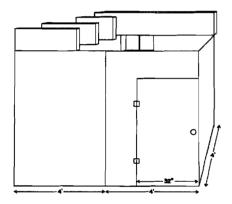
A basement storage area in the corner of a basement with a window. Walls are three sheets of 4- x 8-foot 3/8-inch plywood. Cut a 7-foot x 32-inch door in one sheet. Insulate the ceiling and interior walls. Build shelves and bins around all walls inside the storage area. Leave a small walkway near the door.
